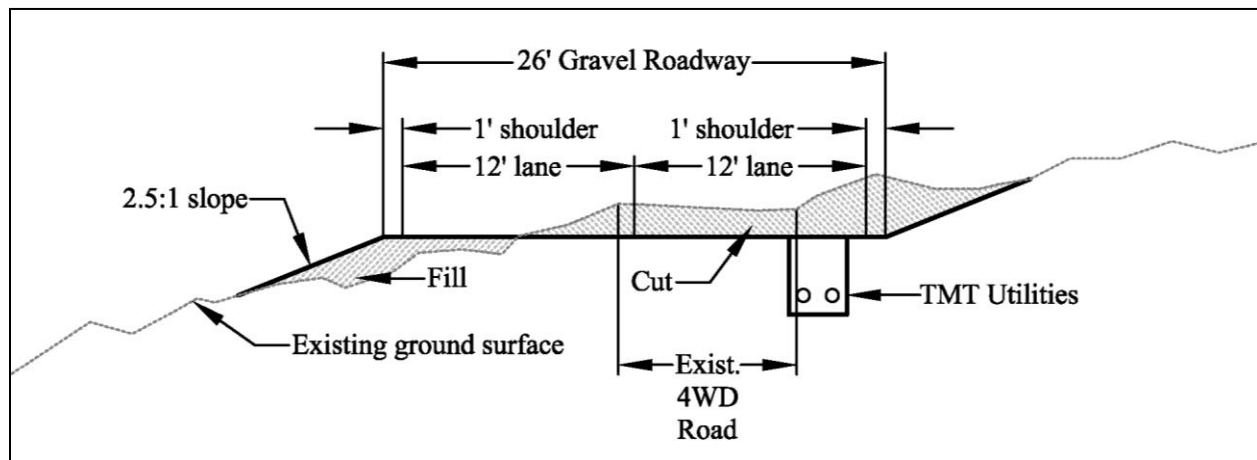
General Cross Section of Access Way in Lava Flow Section Overlapping 4-Wheel Drive Road
